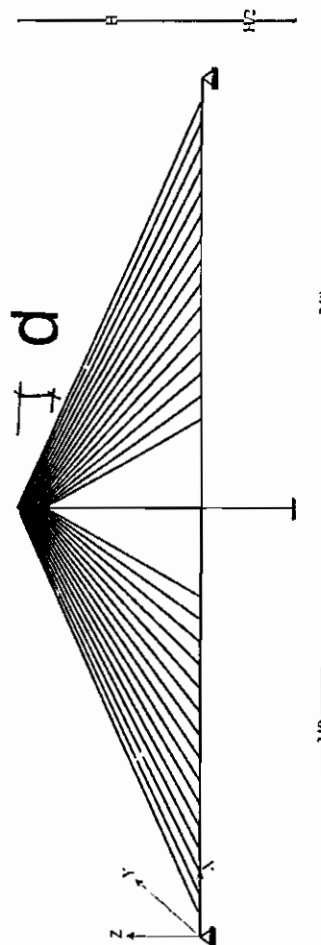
c): Cable stayed bridge with single plane of cables (fan shape).
